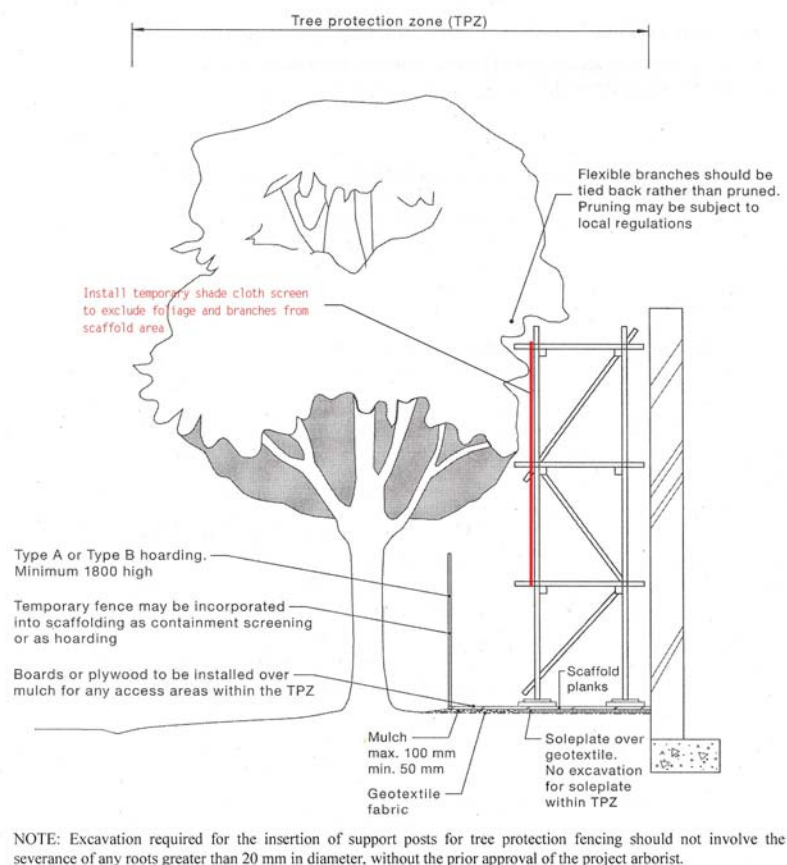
Detail of Temporary scaffolding within a Tree Protection Zone
